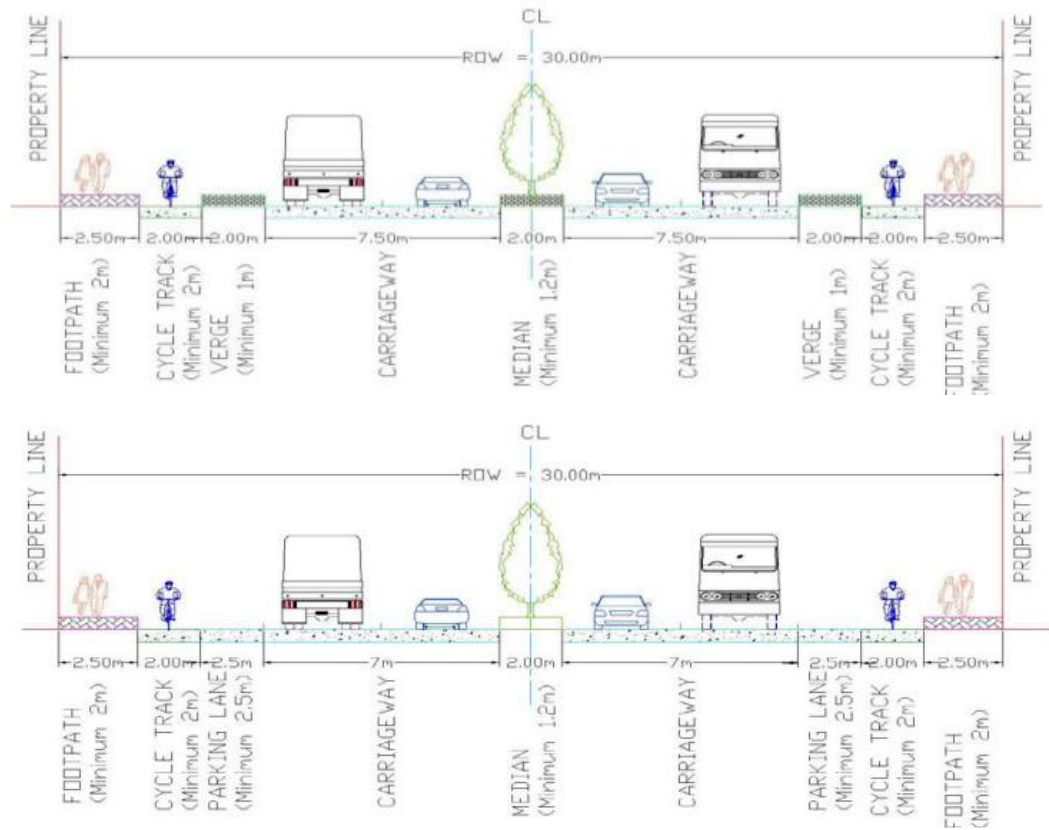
Typical Sub-Arterial Road Sections option 1 and option 2
